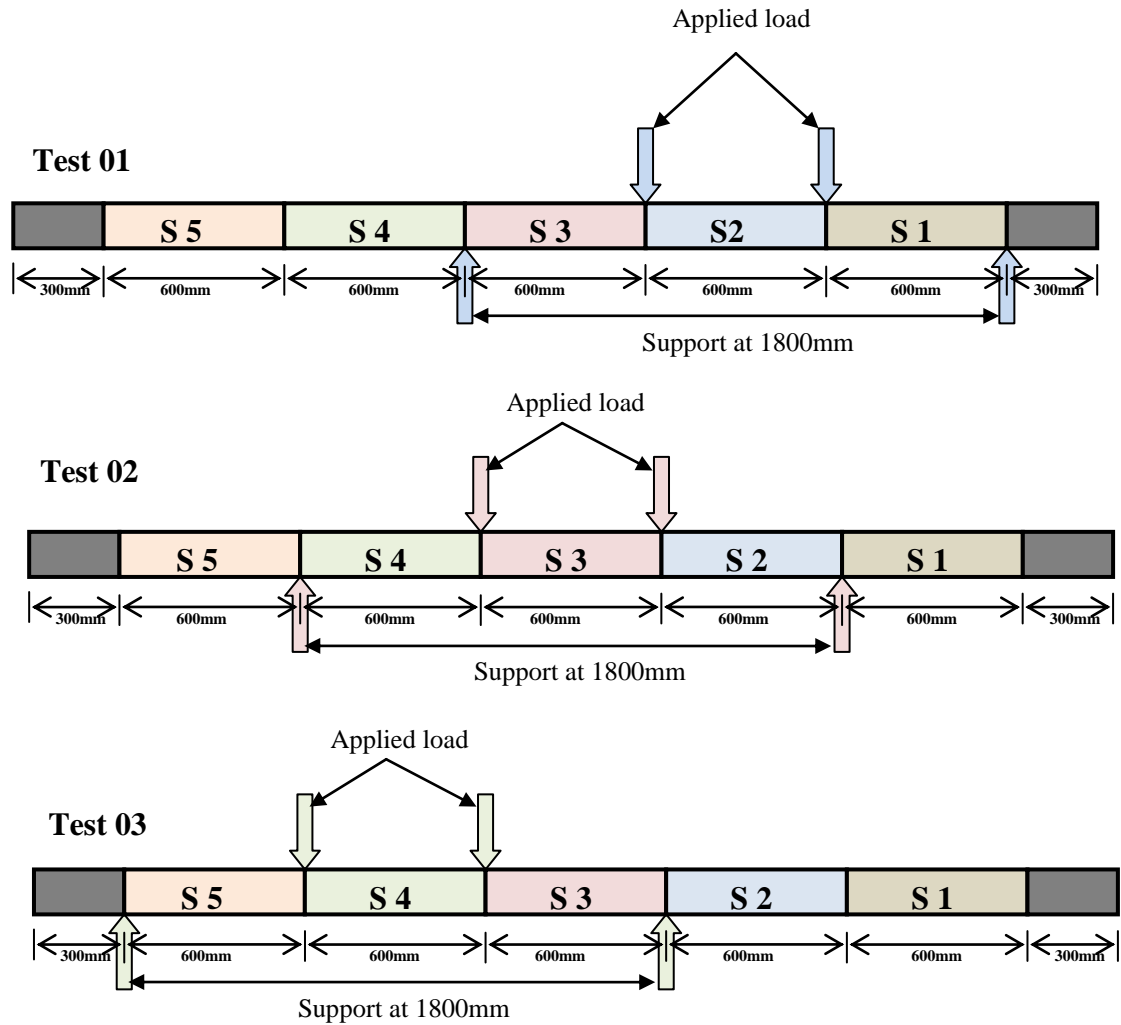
Test arrangements of 3.6m joist under four point applying loads at S2 (Test 01), S3 (Test 02) and S4 (Test 03).
